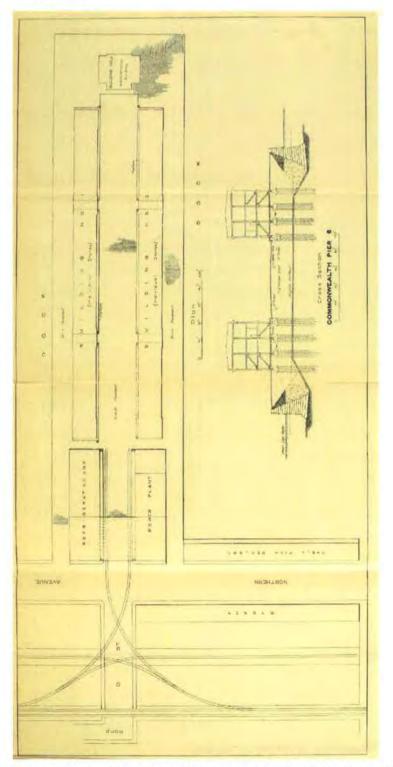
Plan and elevation of Commonwealth Pier 6, the Boston Fish Pier (Directors of the Port of Boston, 1913) (Courtesy of the State Library of Massachusetts).
